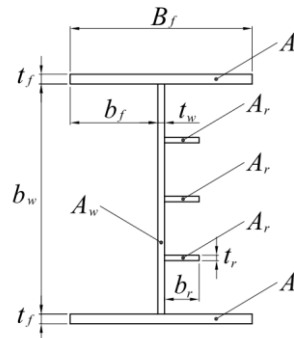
Cross Section of Aluminum Alloy Girder
